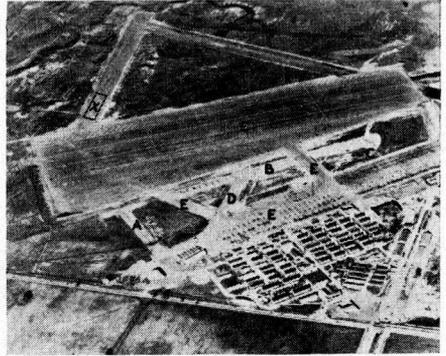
The X in the rectangular box locates the site of the 300,000-lb. test section. The photograph was taken prior to construction of the first Stockton test section, which was located at "D". The pavements at A, B, and C, are 6 in. of emulsion stabilized sand which failed in 1941 under light trainer planes. New pavements were constructed at E and X in 1941-42.
